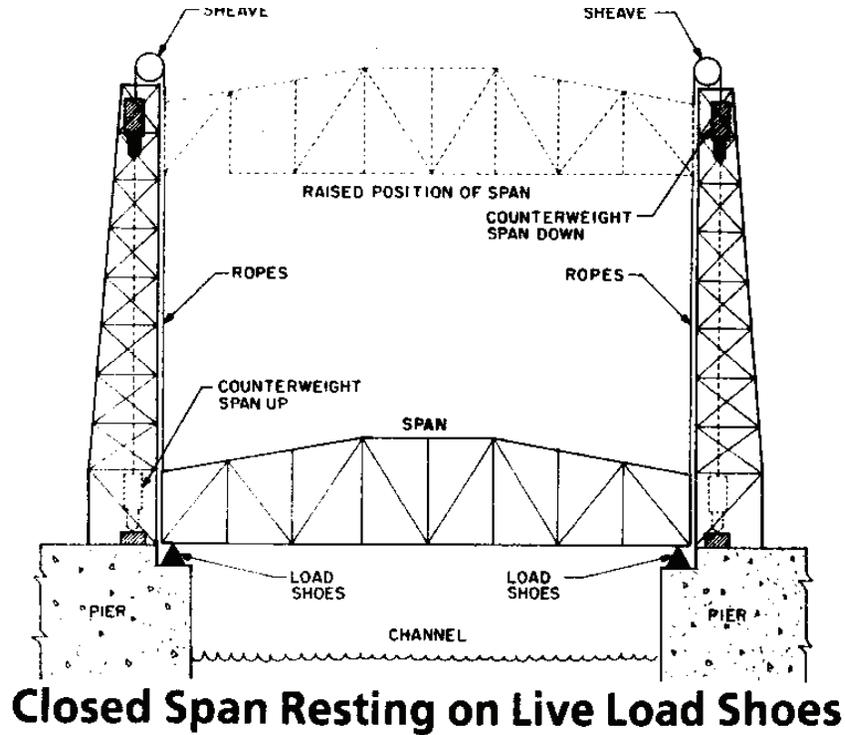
Closed Span Resting on Live Load Shoes
